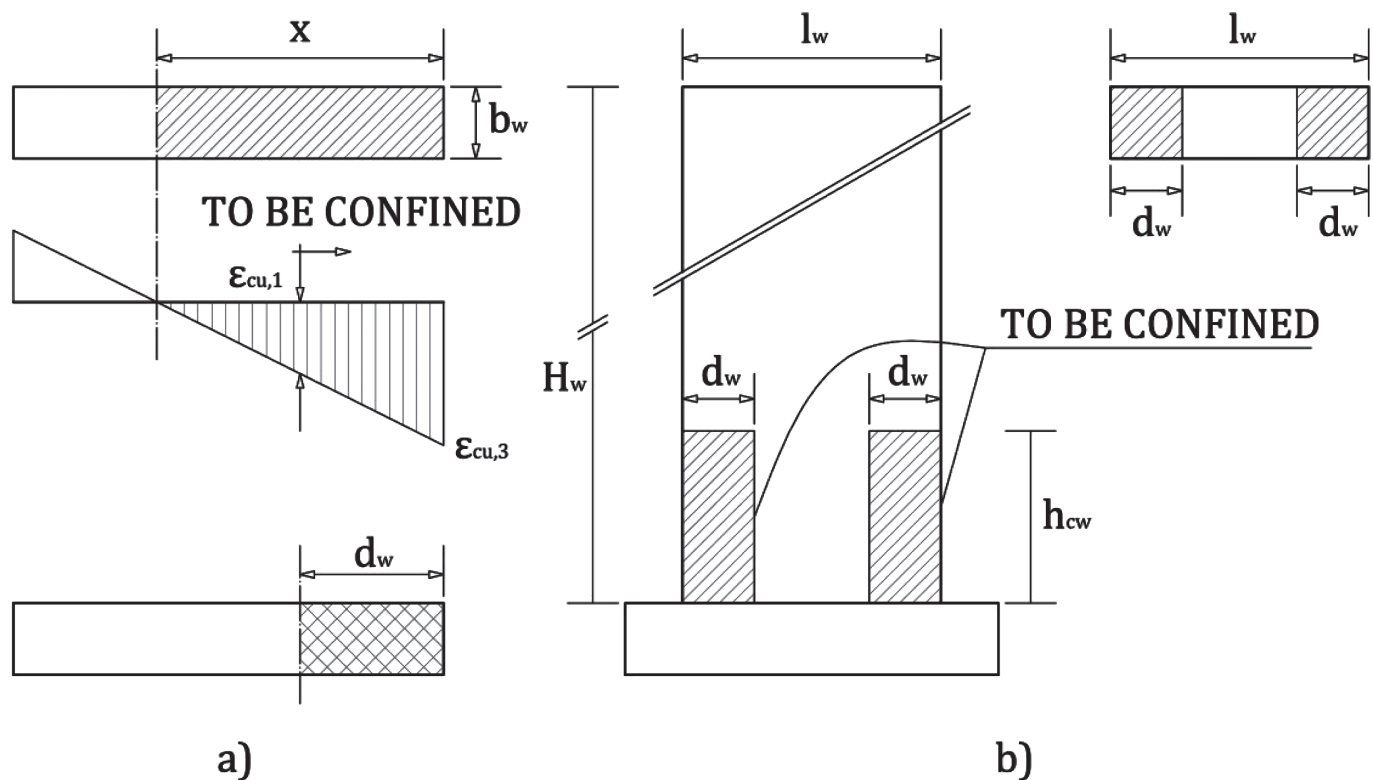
Regions to be laterally prestressed in a RC shear wall: a) horizontal cross-section; b) vertical cross-section. Zone da confinare di pareti di controvento in c.a.: a) sezione orizzontale; b) sezione verticale.
